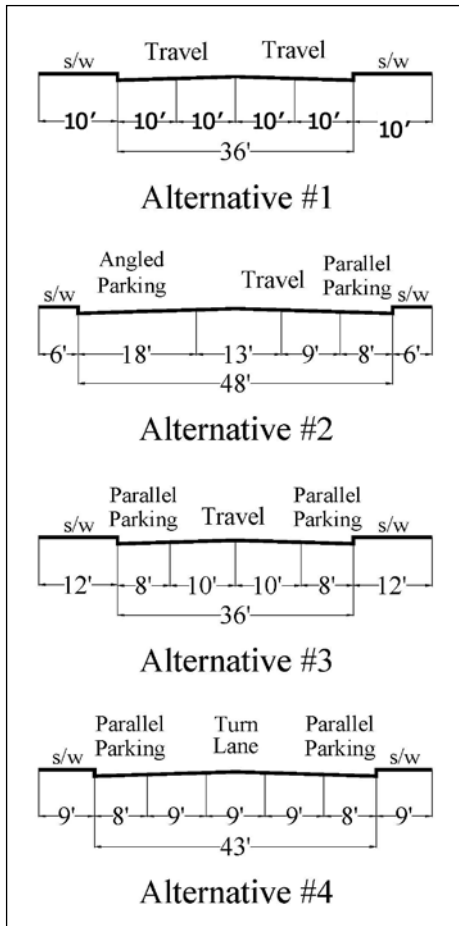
Alternative street cross sections. Source: Kimley-Horn and Associates, Inc.
